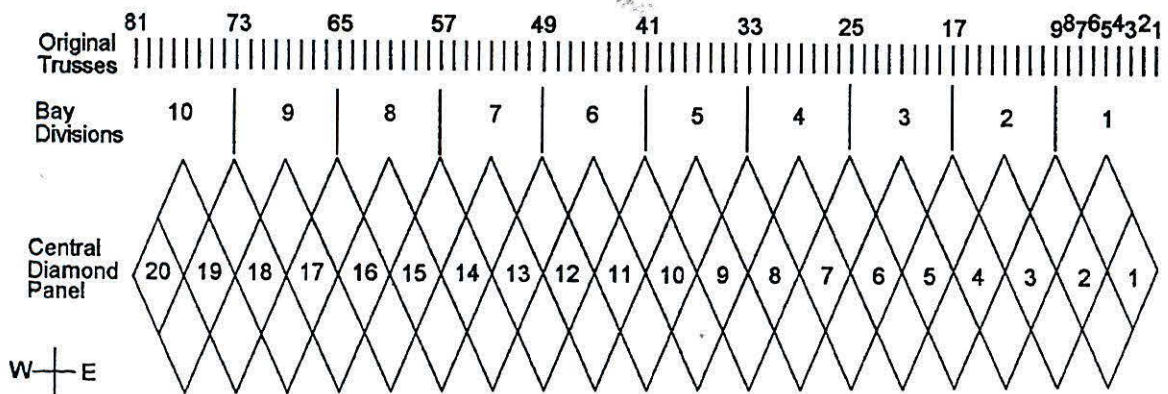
Plan of the ceiling from below highlighting the bay divisions and the location of panels 28/I to 35/IV
